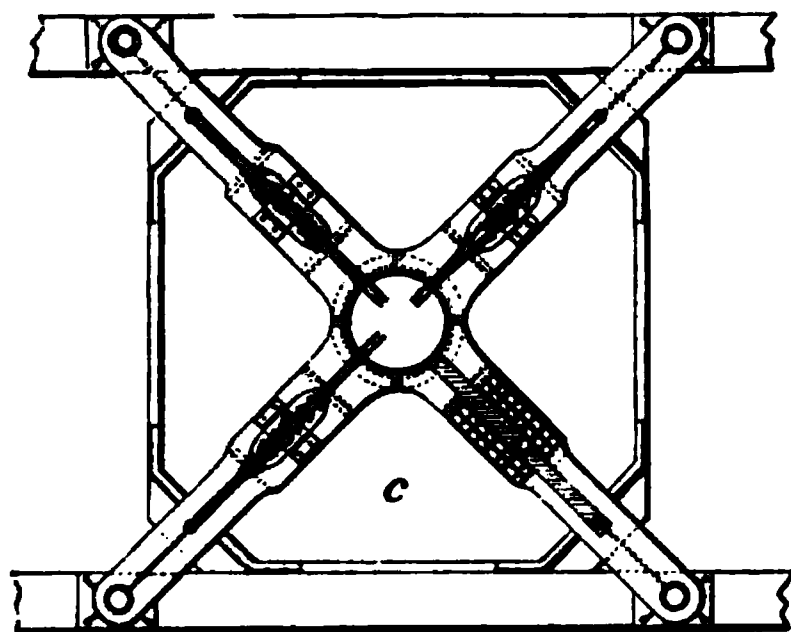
Furnace-Hoist, Ayresome Iron-Works; plan.
